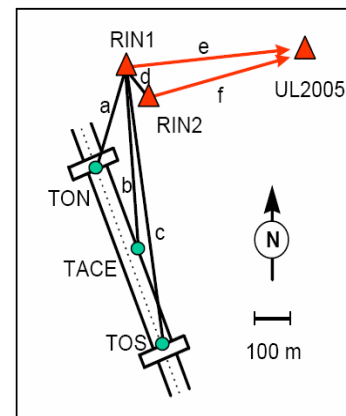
Instrument configuration of Pierre-Laporte Bridge [Santerre and Lamoureux, 1997]
